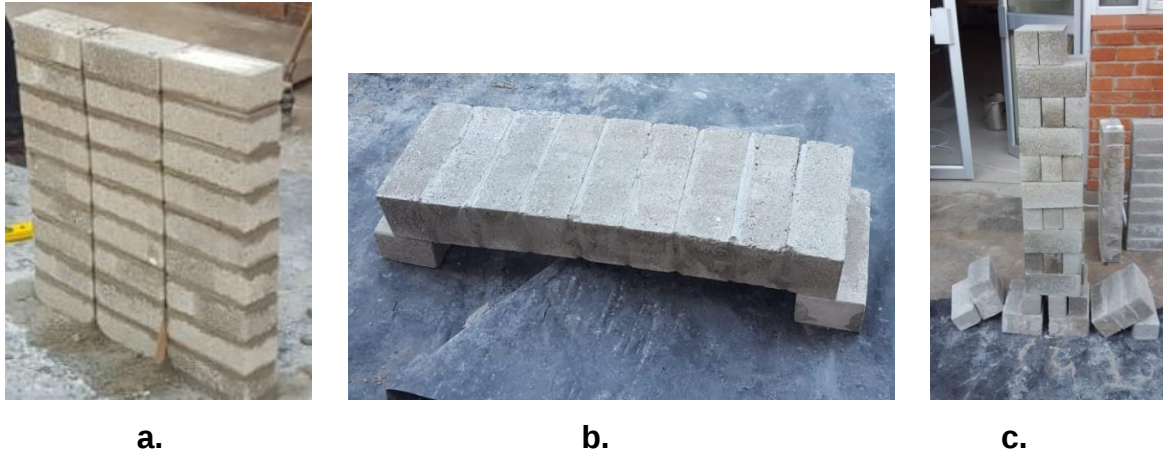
Three stages of the masonry bond strength test a. Three piers, b. Beam, and c. Broken beam
